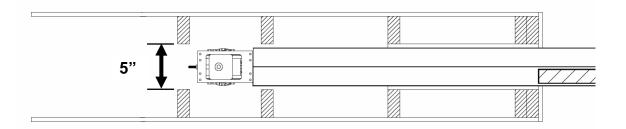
<u>Top View</u> of Clearance Needed for Motor Assembly Installation <u>Inside Door Pocket</u> (Shown with Two Track Installation)
